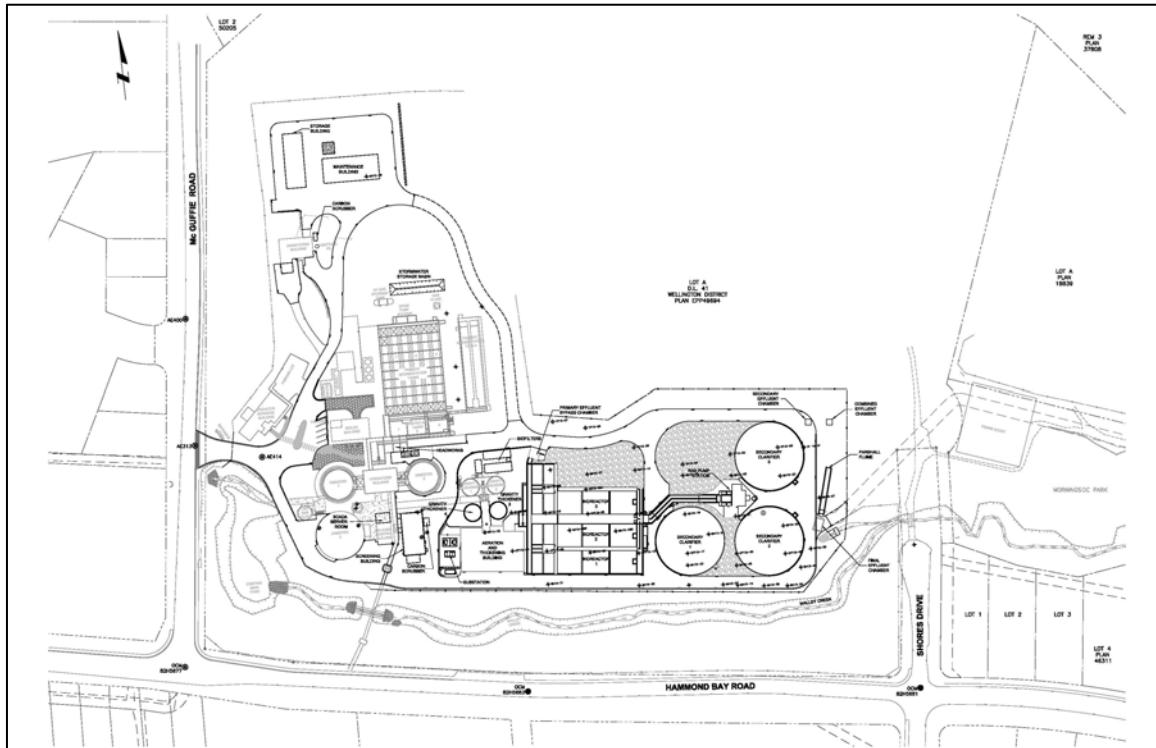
Overall site plan of proposed GNPCC Secondary Treatment Upgrade project
